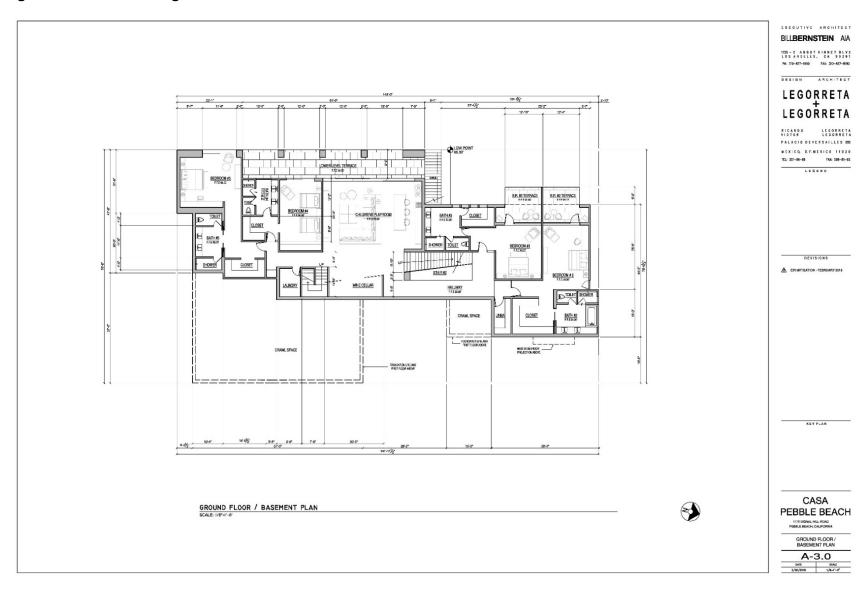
Reduced Height Alternative Ground Floor/Basement Plan
